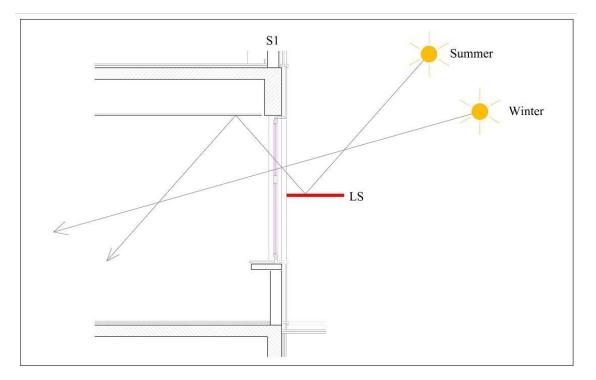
Light shelf representation for the case building (Drawn by the Author)
